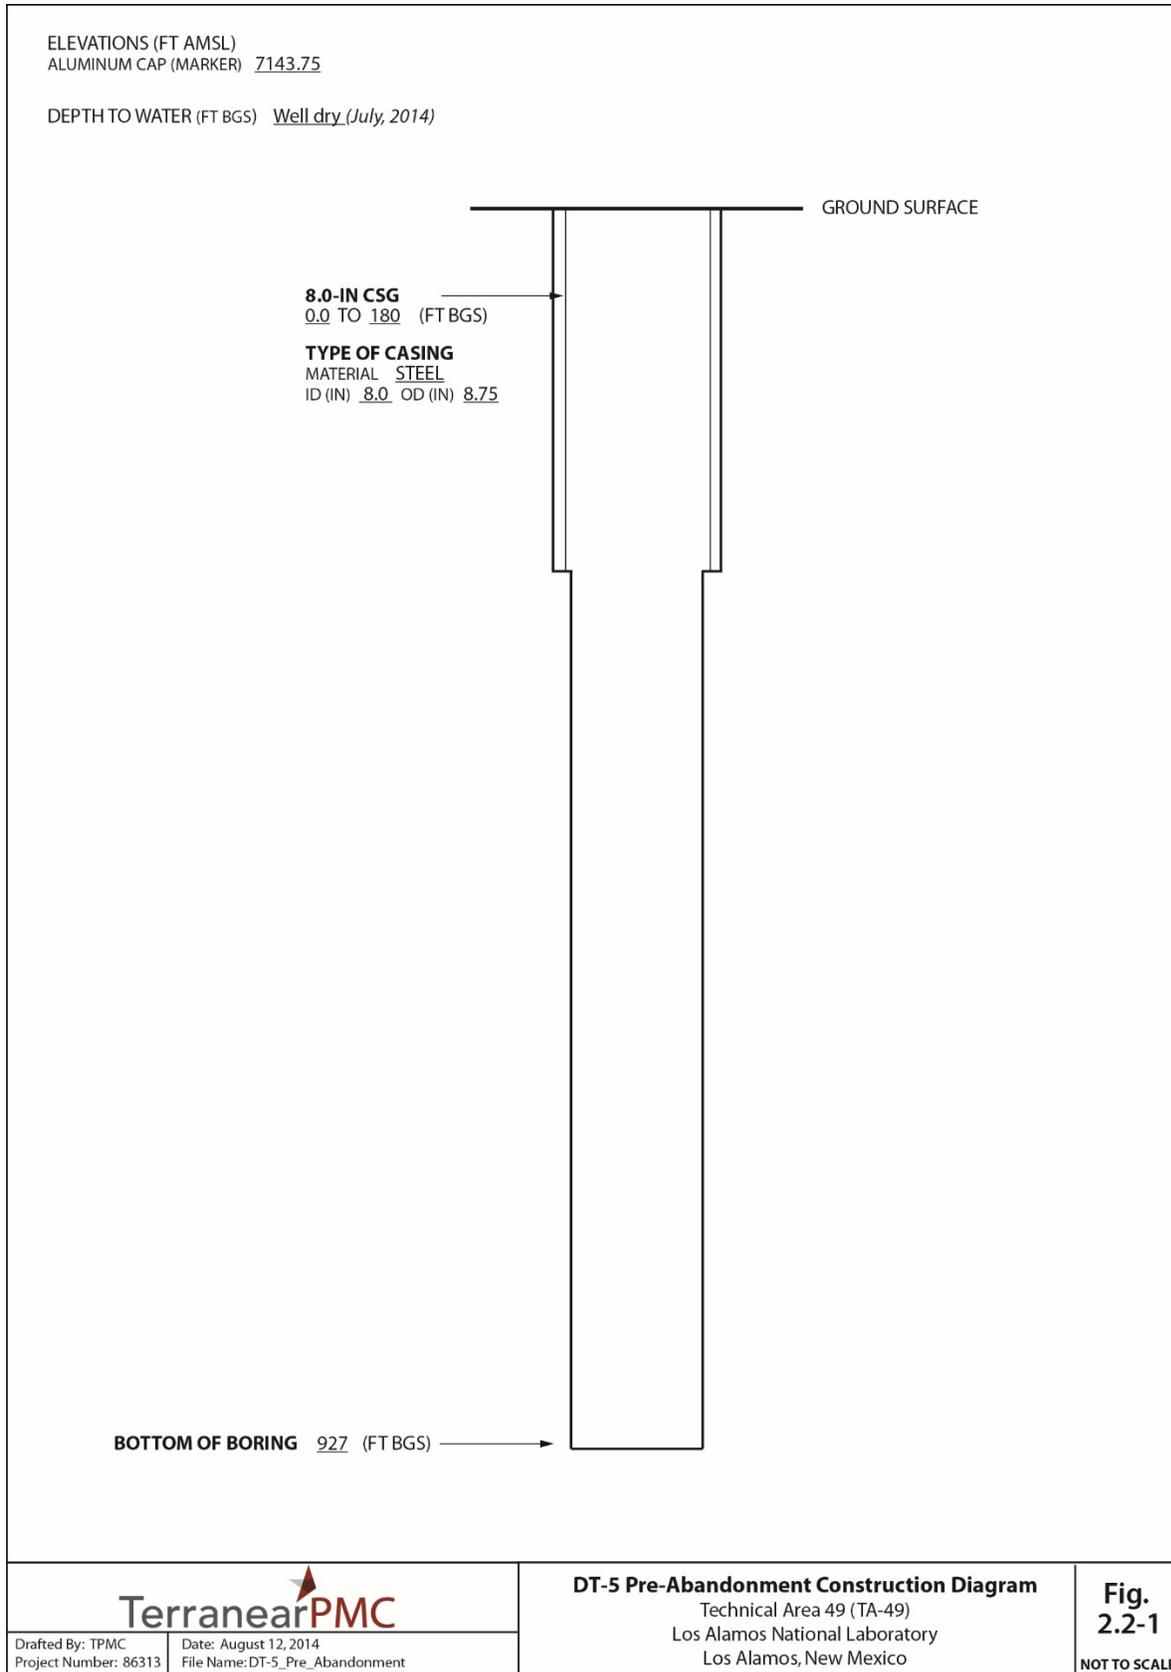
Test well DT-5 pre-abandonment construction diagram
